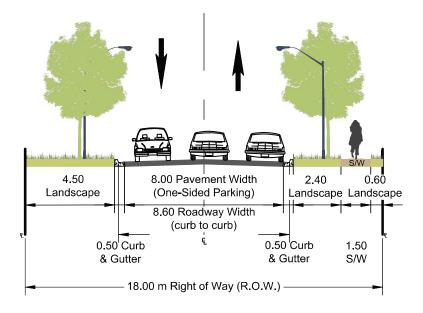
Conceptual cross section for 18.0m Local Road
